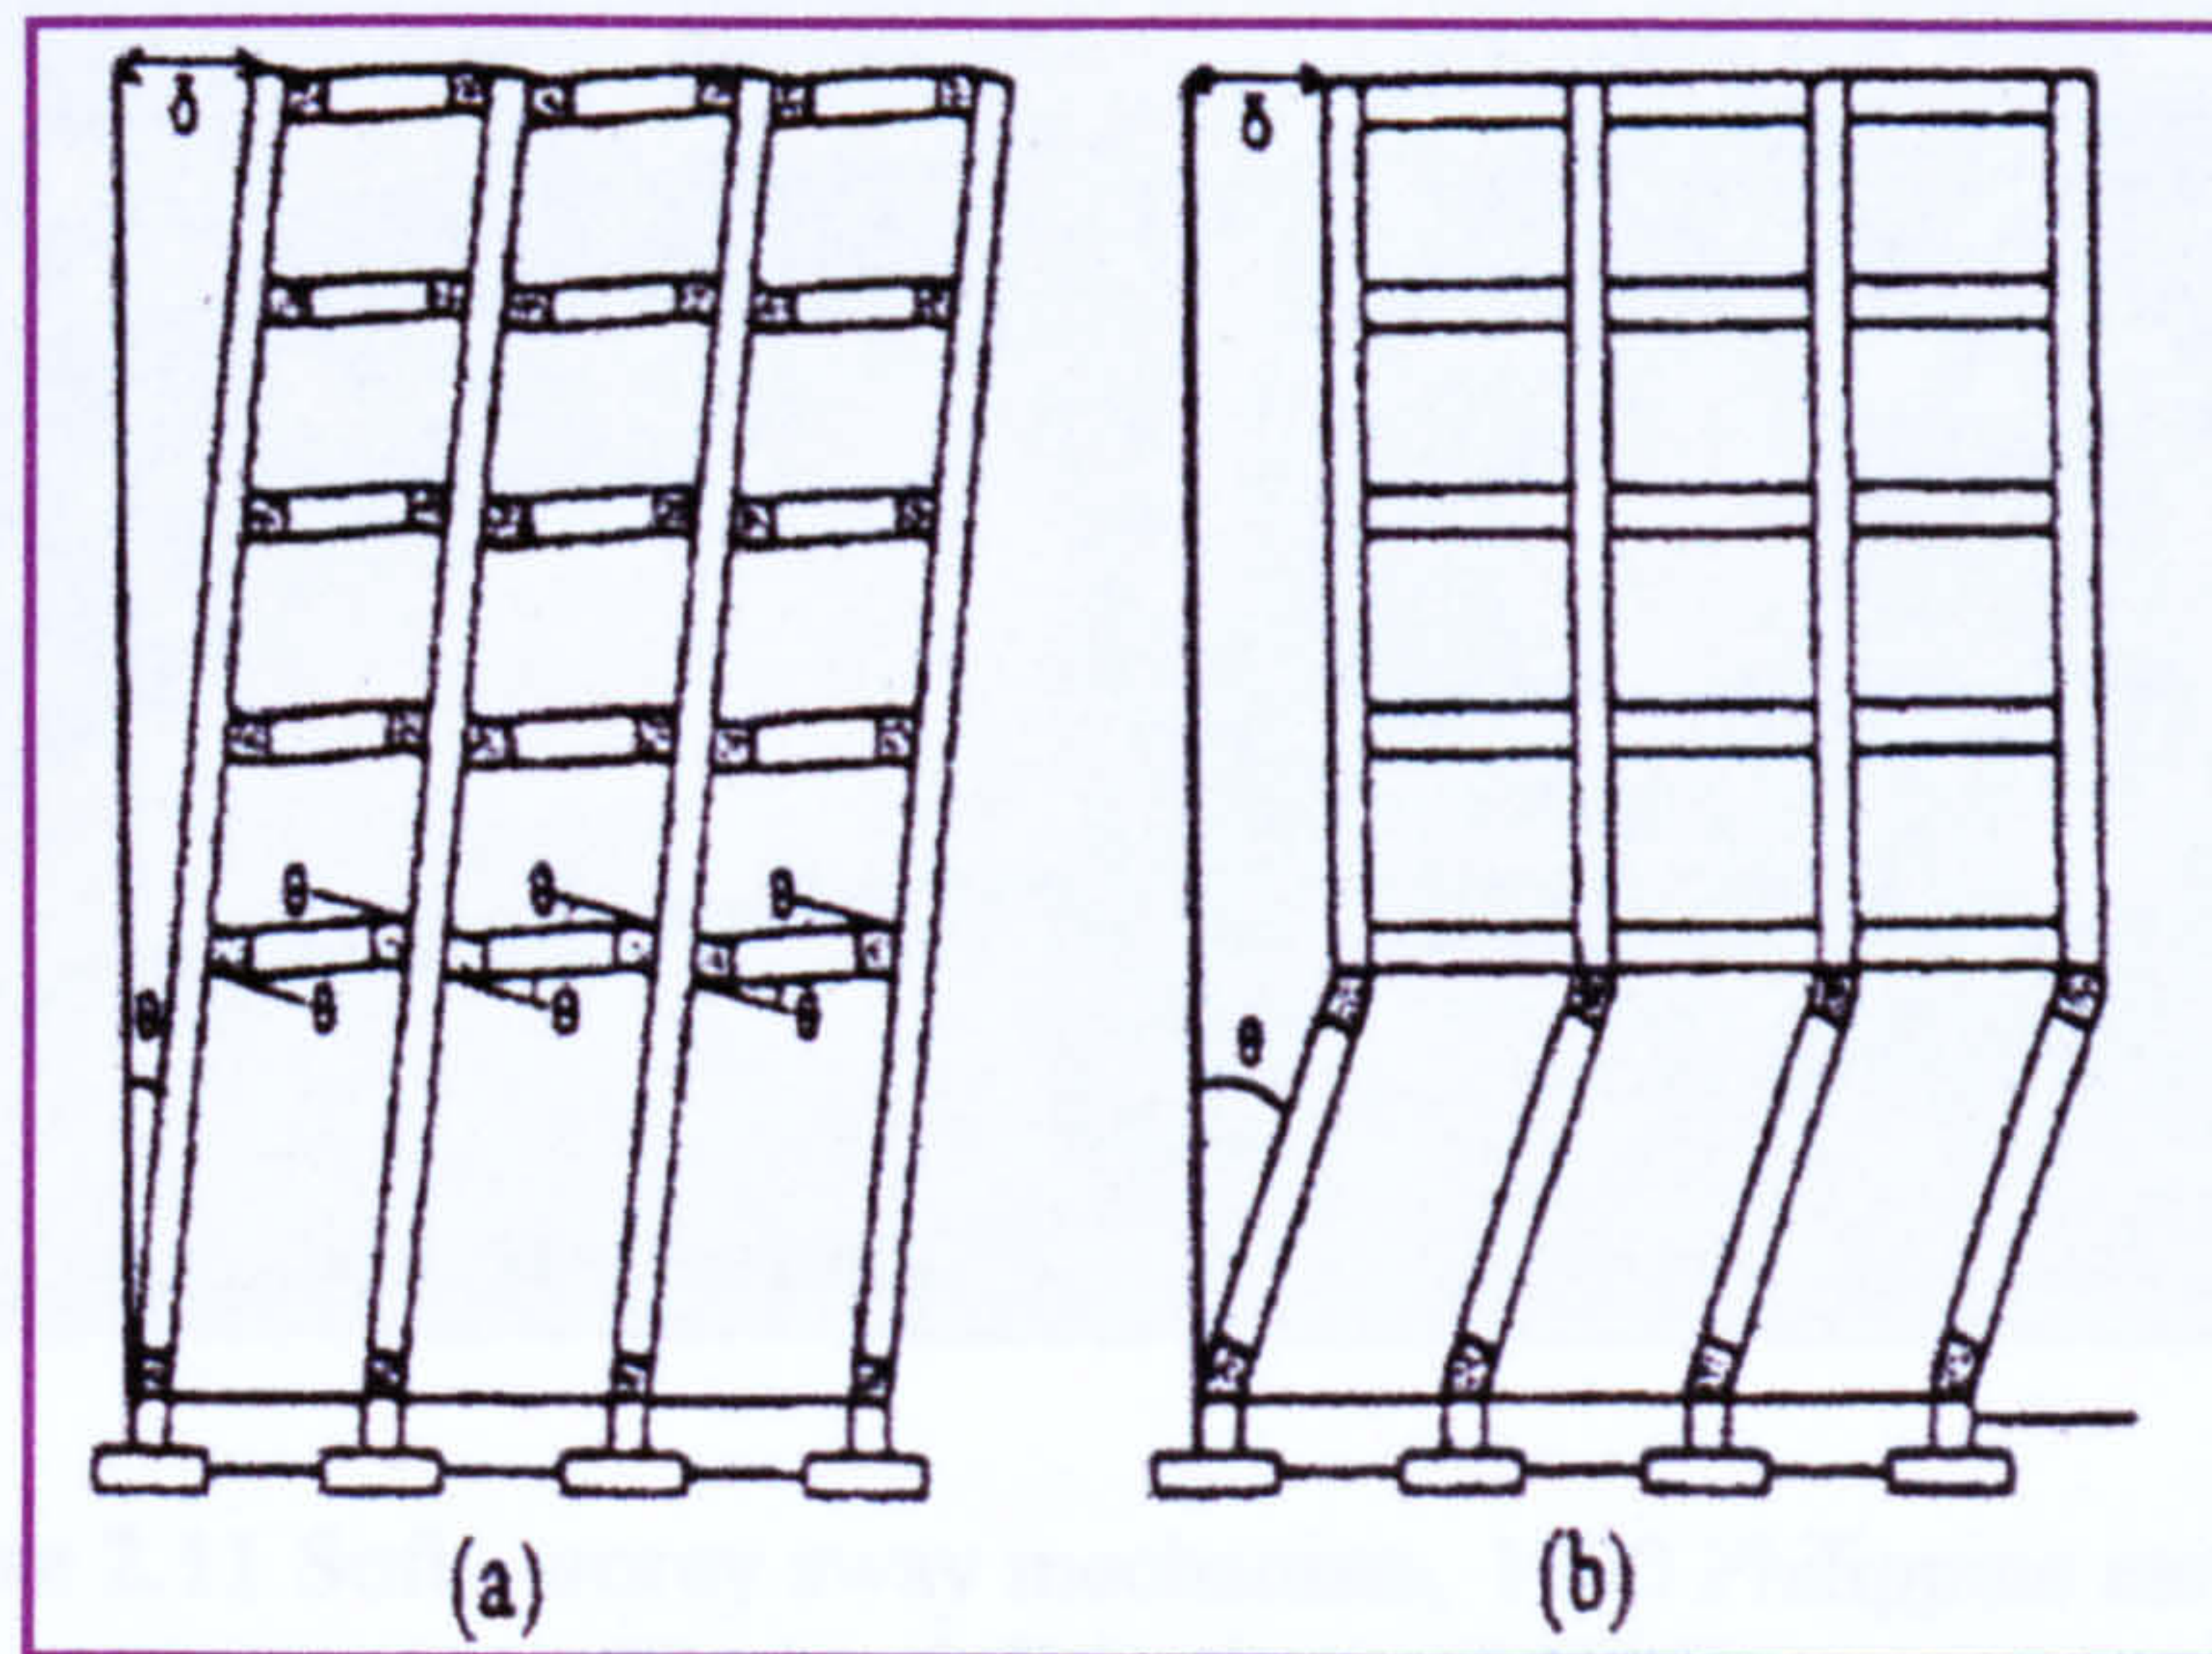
Possible collapse mechanisms of reinforced concrete portal frame (Moy, ref. [11] and Horne, ref. [18])
